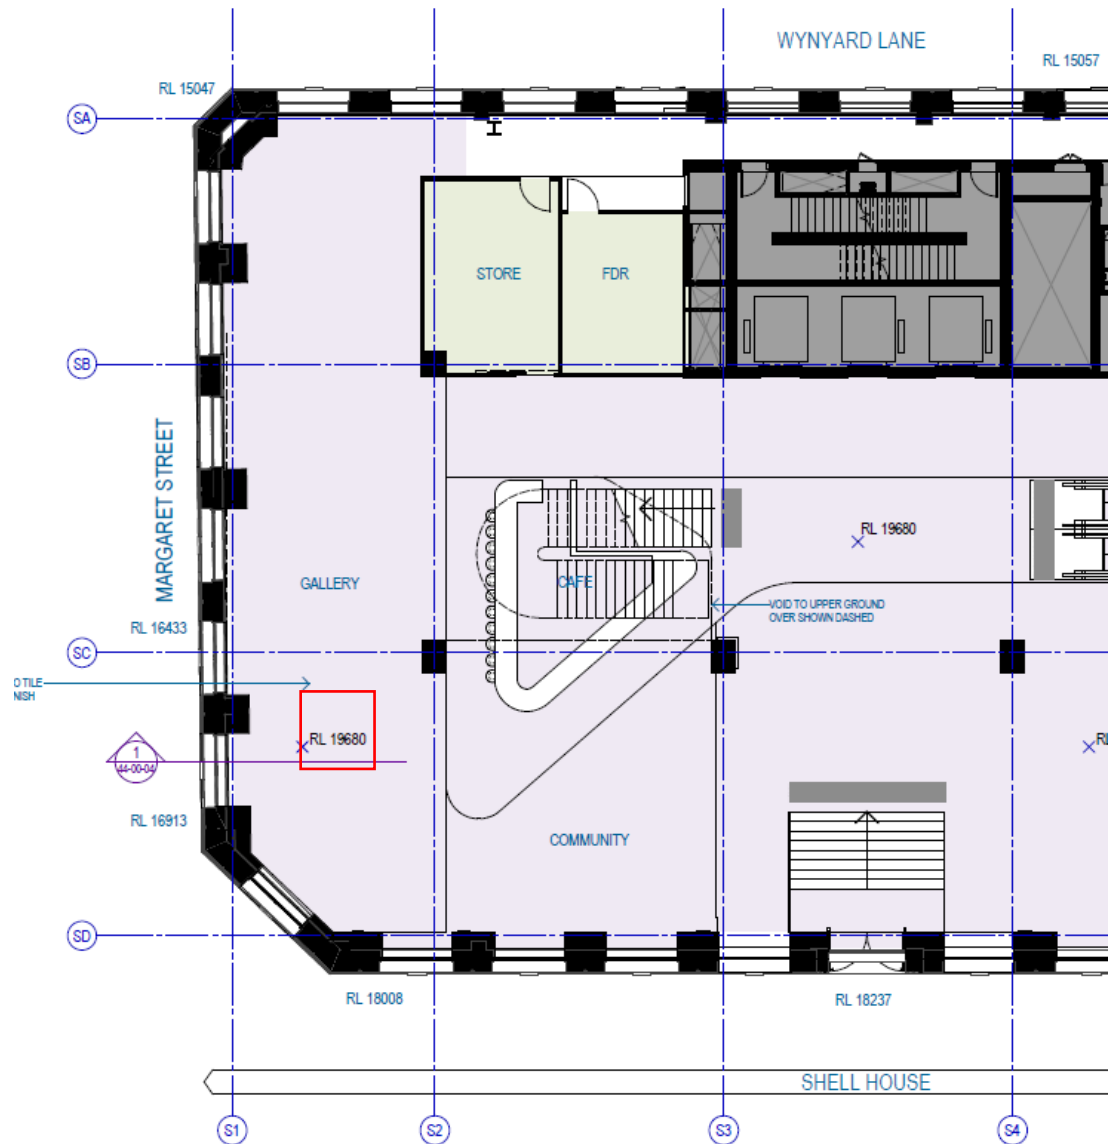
Extract from Floor Plan – Carrington St – approved in D/2018/318 - note RL in red box
